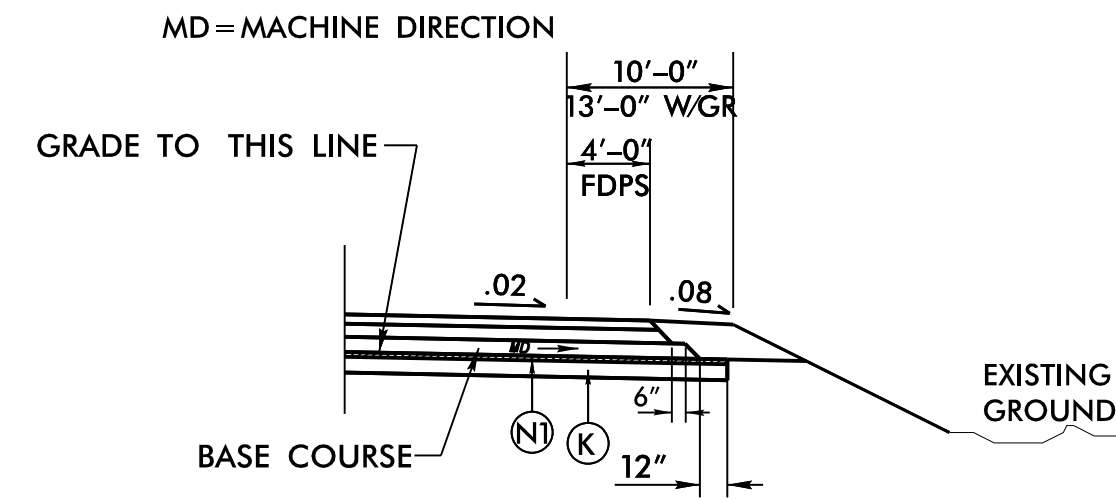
DETAIL SHOWING AGGREGATE SUBGRADE FOR SHALLOW UNDERCUT IN SHOULDER SECTIONS
